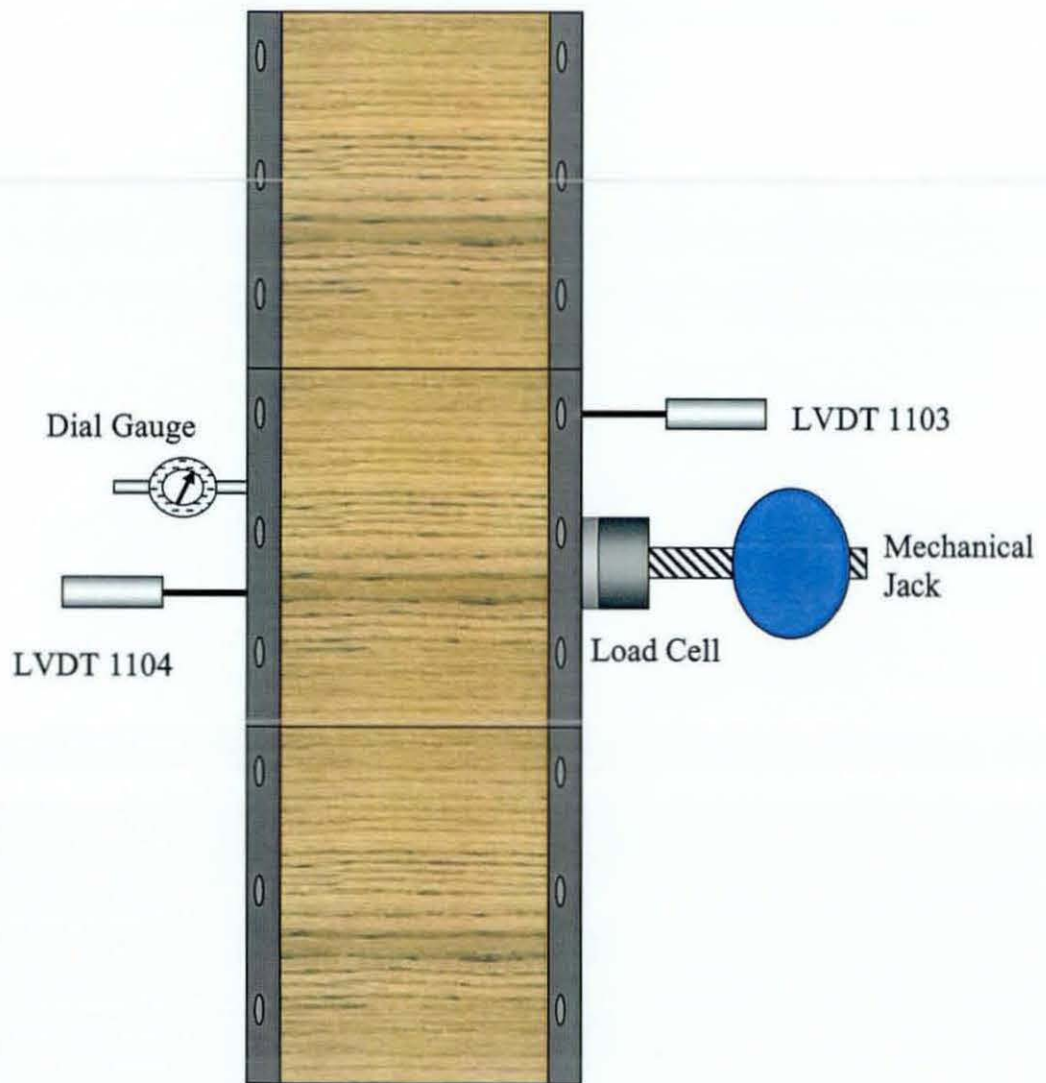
Plan view of instrumentation lay out for large scale testing
